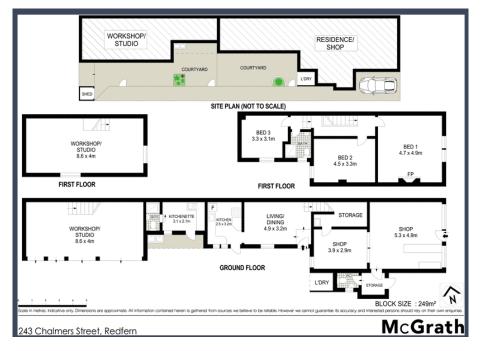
Real estate floorplan of 243 Chalmers Street, Redfern.⁸⁷
